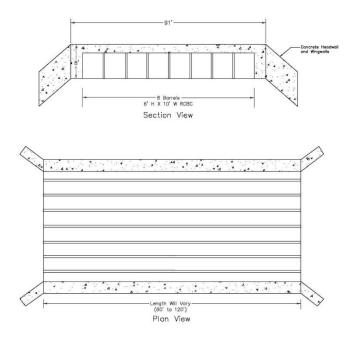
Typical Canal Road Crossing Structure – 1,500 cfs Canal
